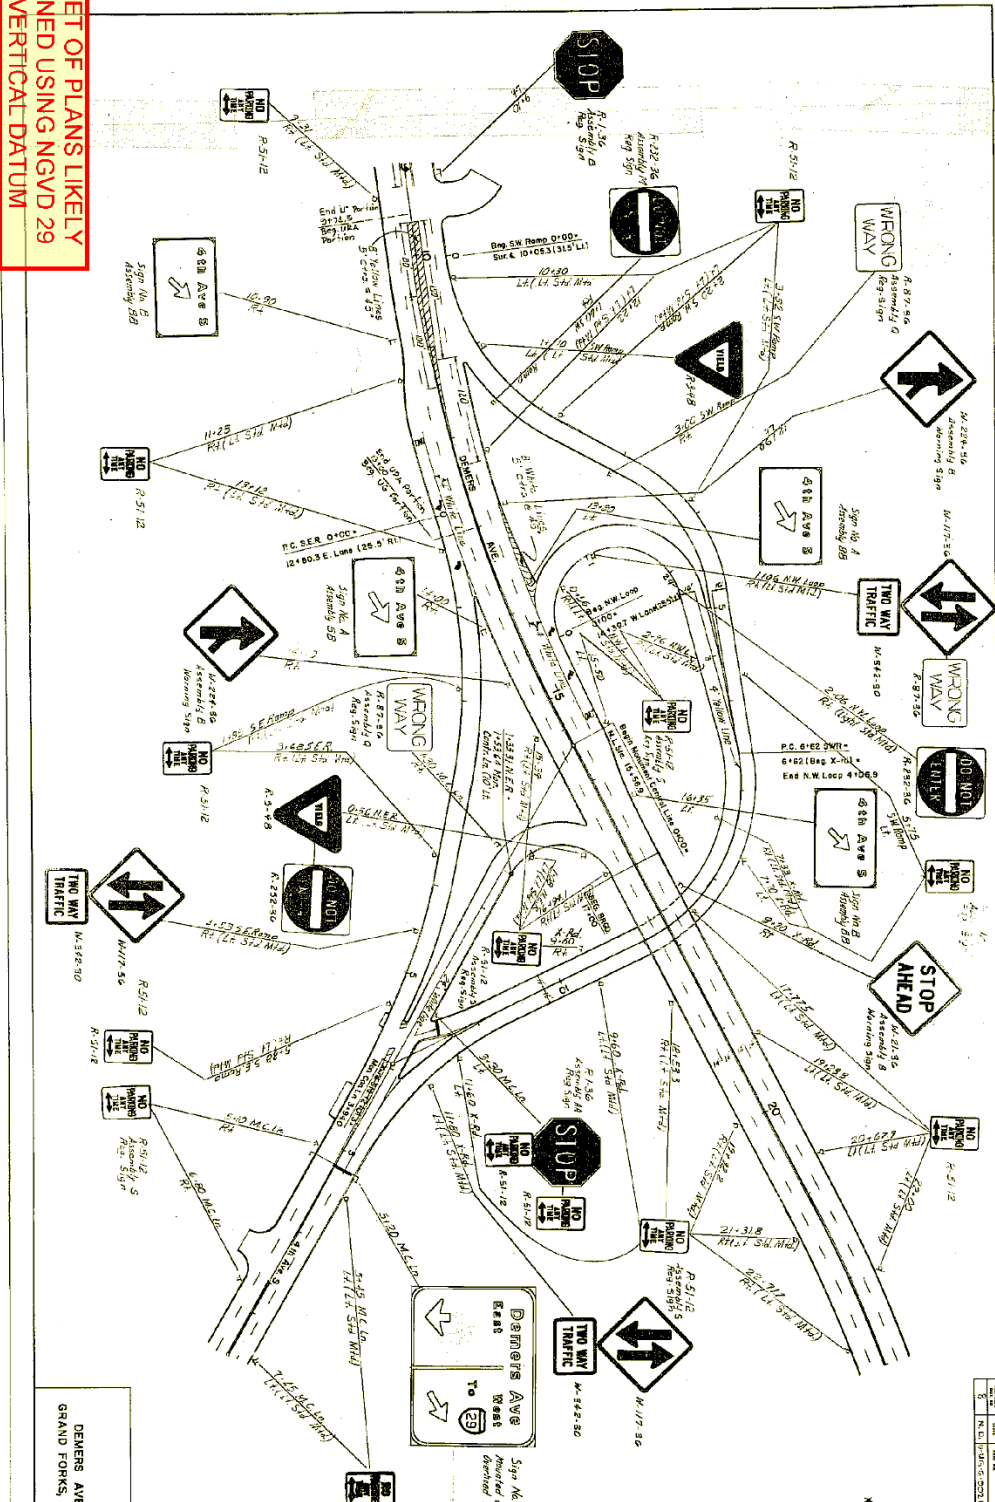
Engineering plan – design of overpass with entry and exit ramps.
